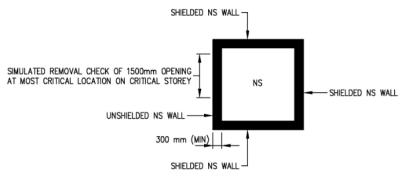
B(i): UNSHIELDED NS WALL OF SS TOWER
